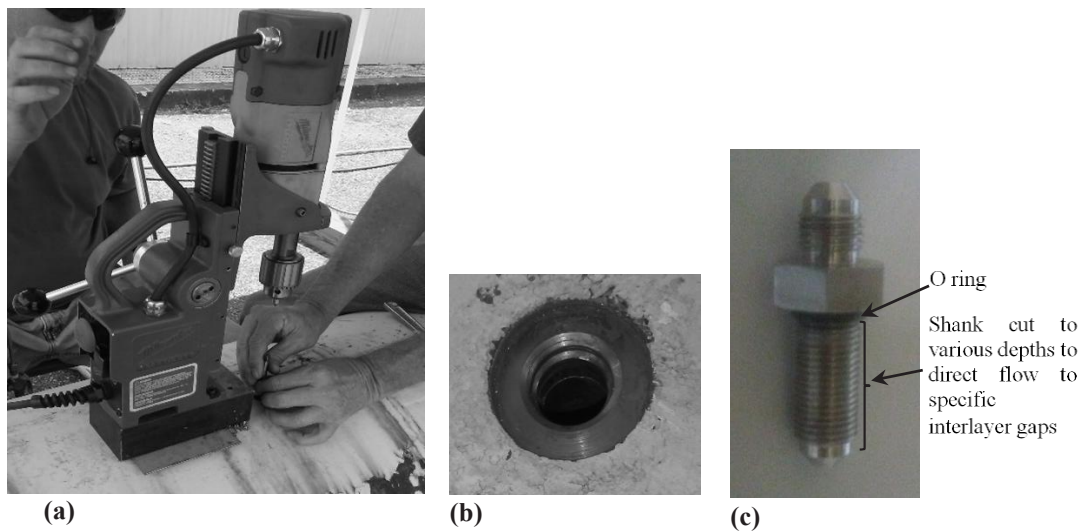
(a) Hole preparation, (b) finished hole, and (c) bulkhead fitting
